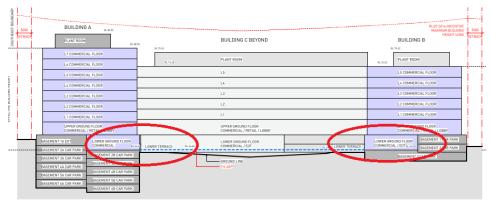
Amended plans lowered the ground floor to RL 44.5 to connect with the open space.
